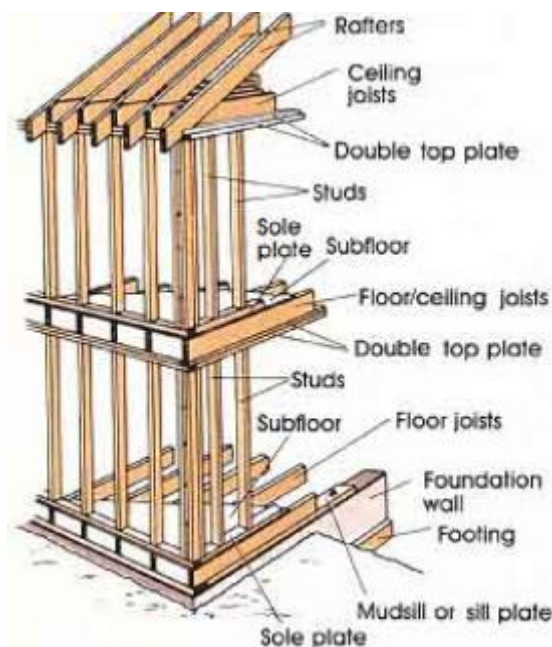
Typical platform framing diagram, the walls are broken into sections as a load bearing element carries the “platform” above. [78]
